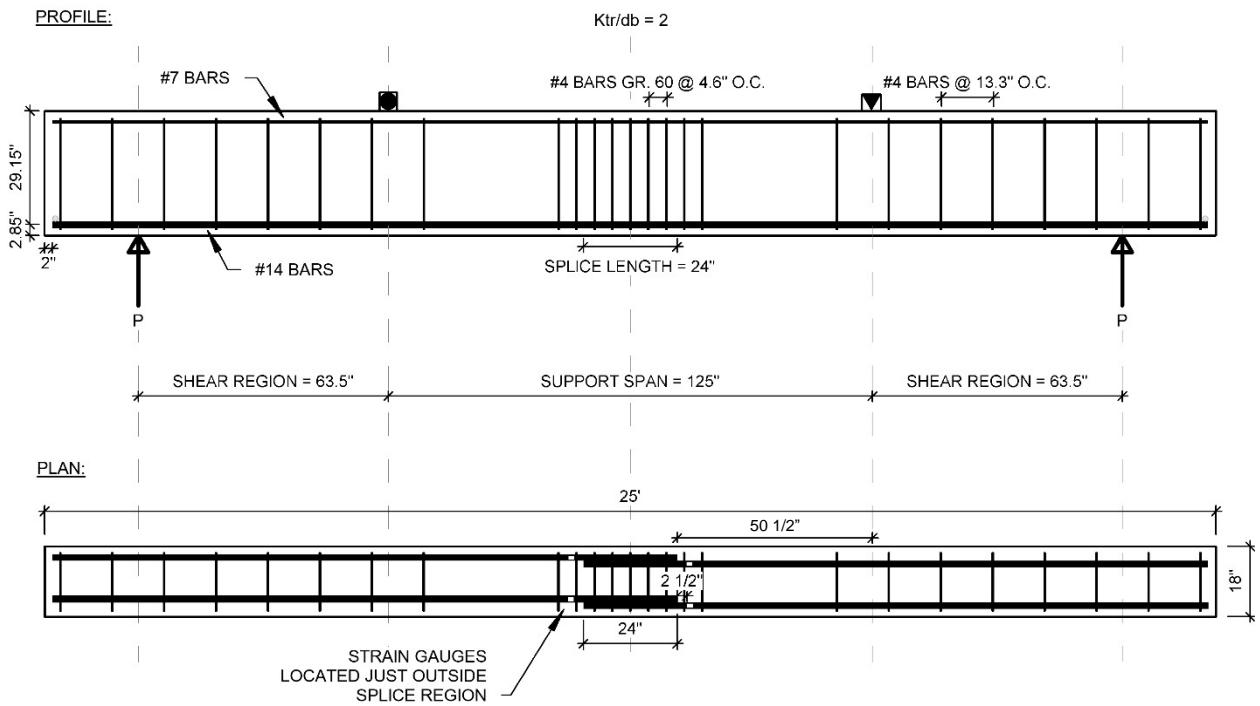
Profile and plan of 14-e (1 in. = 25.4 mm)
